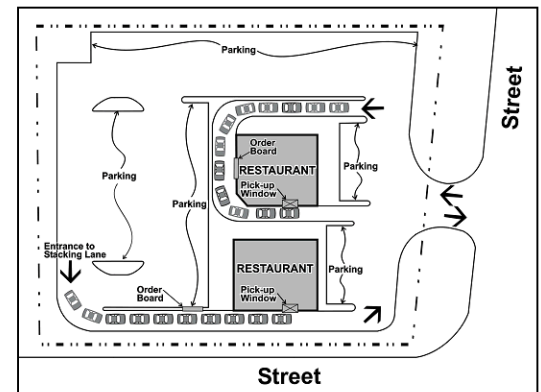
A typical layout with double stacking lanes. Note that both buildings are internalized on the site and surrounded by parking or stacking lanes.
